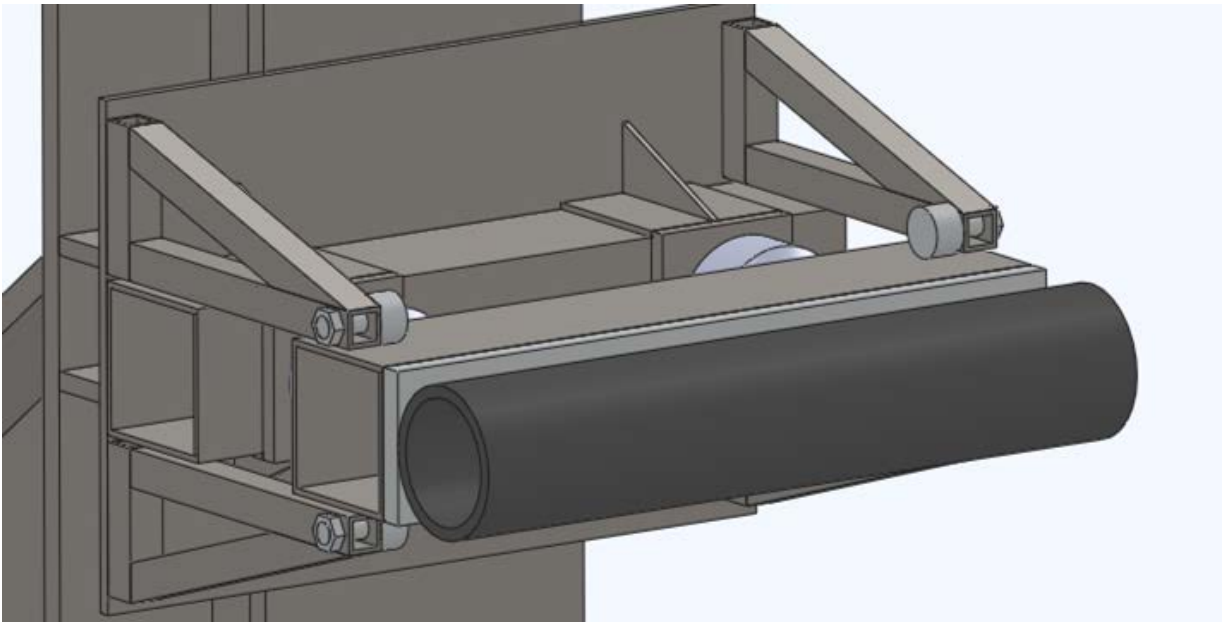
Rubber bumper for frame specimen tests; bumper outer diameter 178 mm, wall thickness 25 mm.
